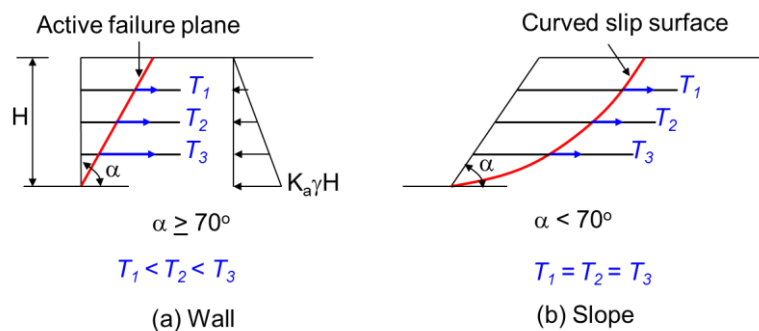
Reinforced fill wall versus slope (modified from Han [8])
